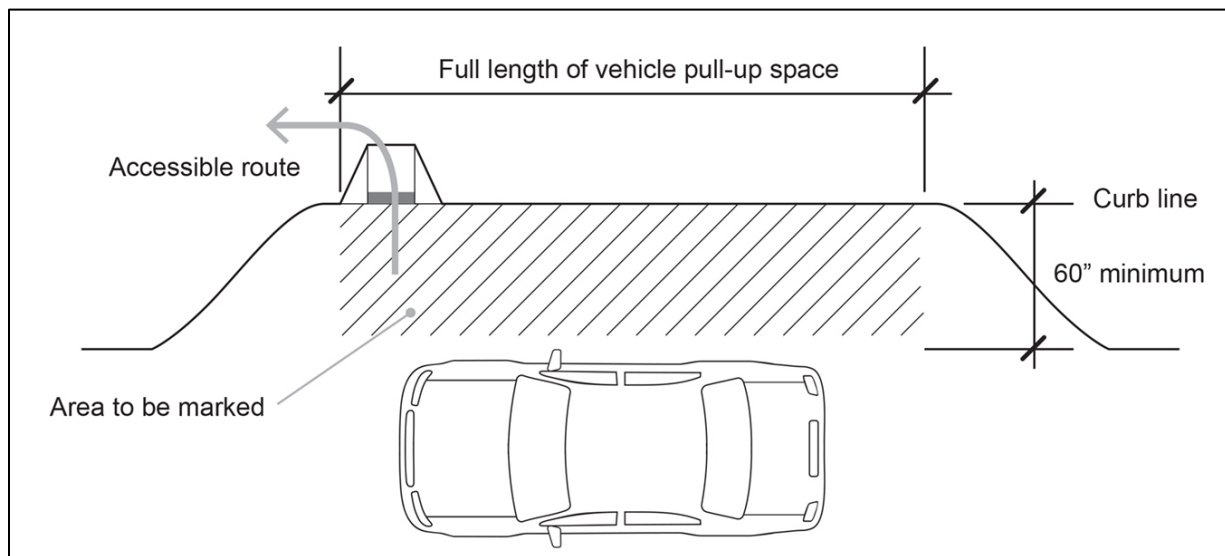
Required Dimensions for Passenger Loading Zones and Access Aisle
